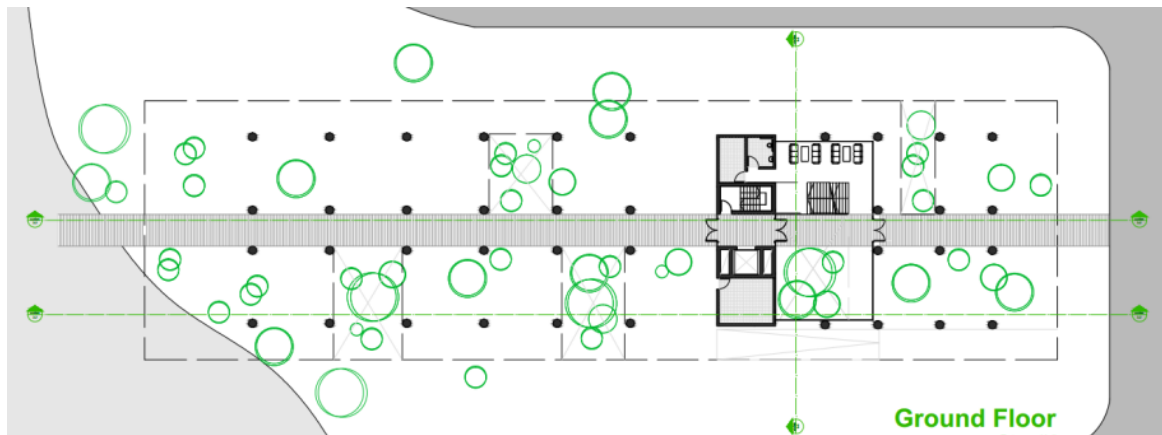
Layout of the Ground floor showing the entrance to the building and the exterior space.
